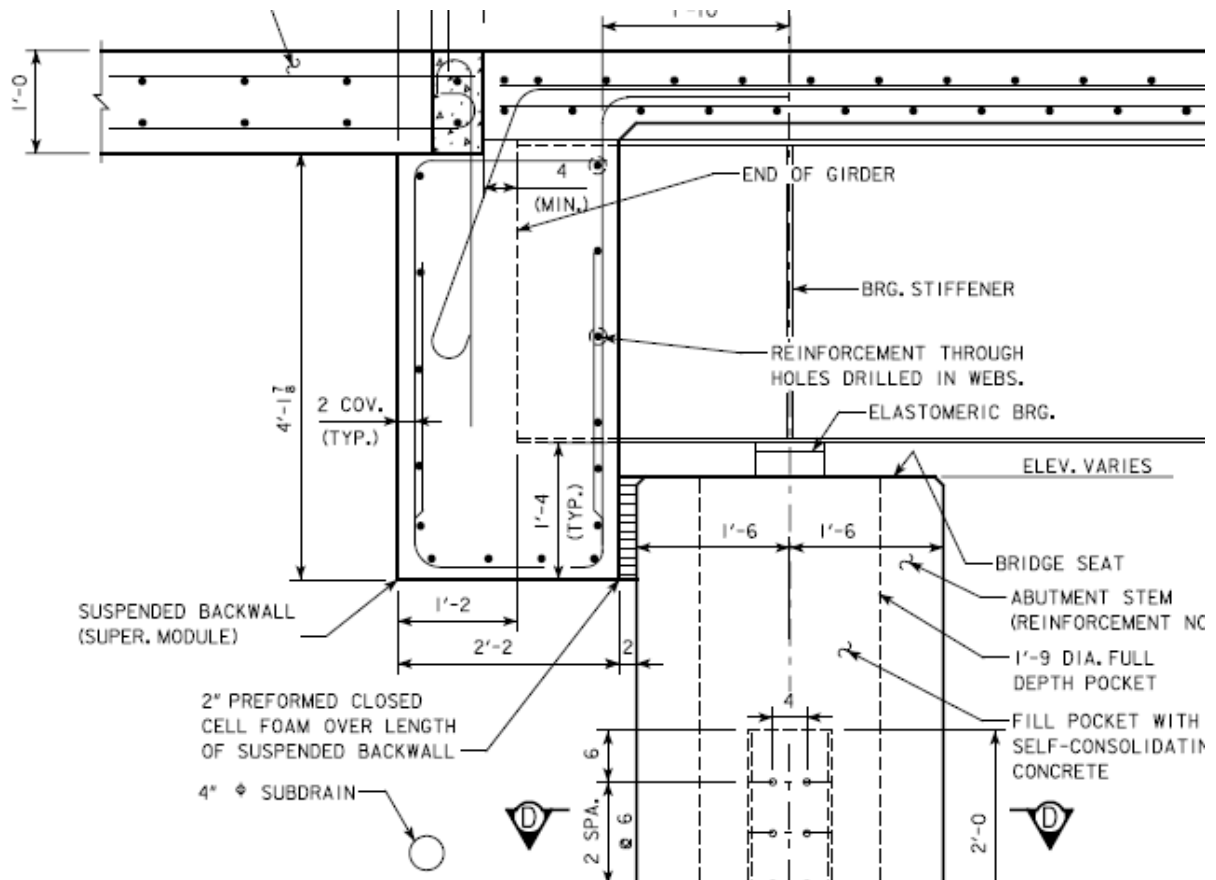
Detail of semi – integral abutment with approach slab and flooded backfill
